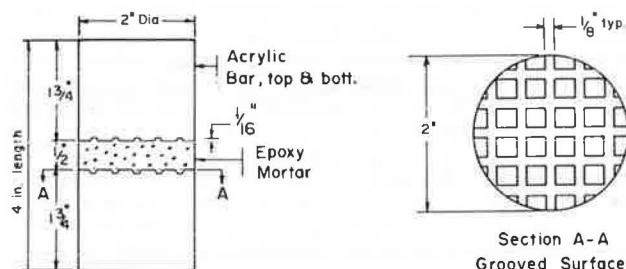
Sandwich cylinder specimen for fatigue testing.
